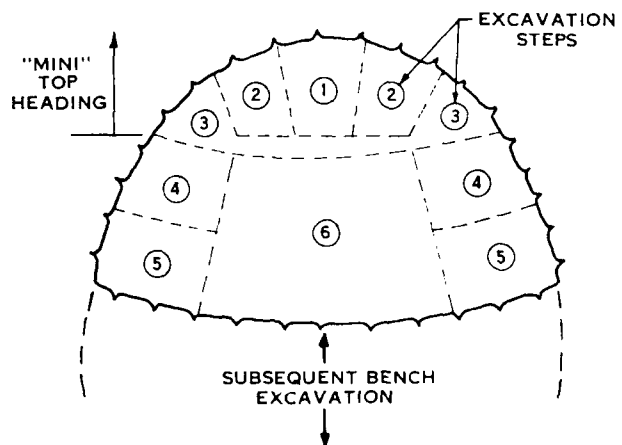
SEGMENTED EXCAVATION SEQUENCE IN TOP HEADING UTILIZED IN VERY POOR GROUND.
